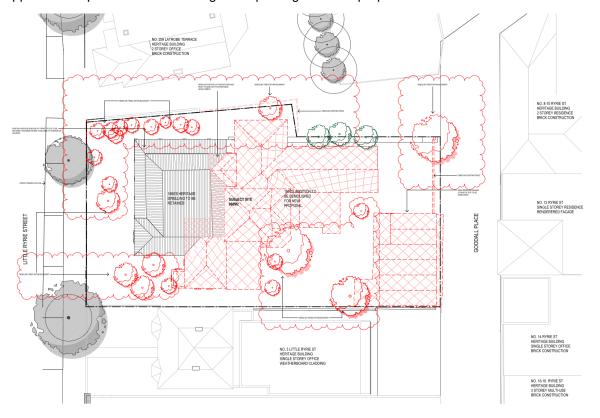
Demolition and retention plan (Source: Cera Stribley Architects)
